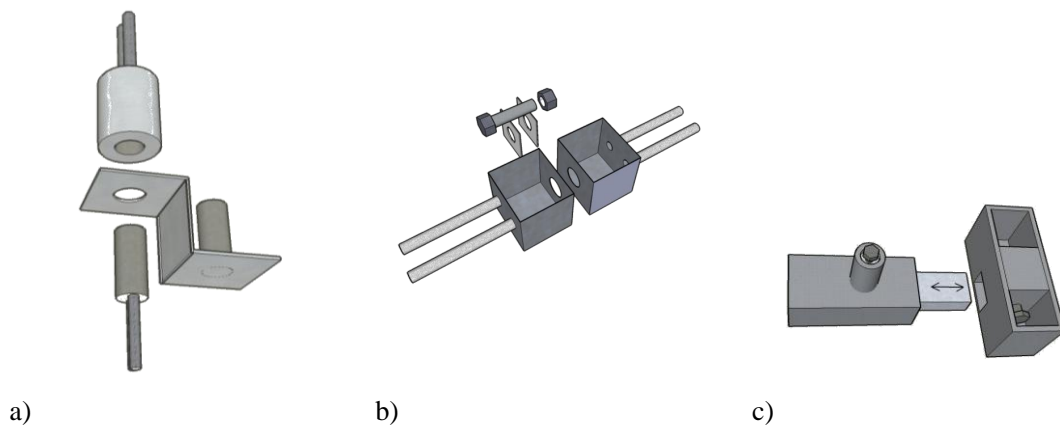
Including connection devices: a) wall-to-floor, b) wall-to-wall/ floor-to-floor and c) floor-to-floor device in case of big shear forces.
